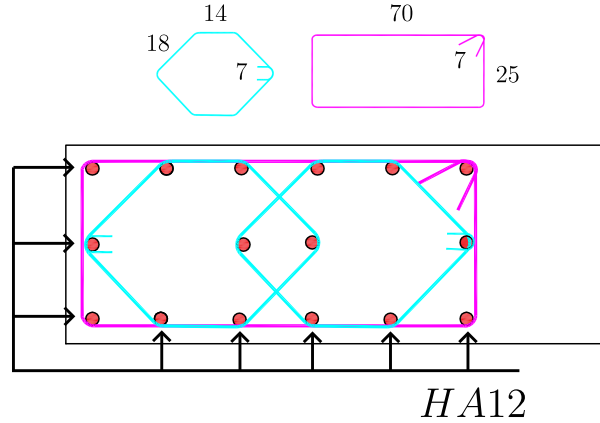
Confined boundary zone horizontal and vertical reinforcement details.
